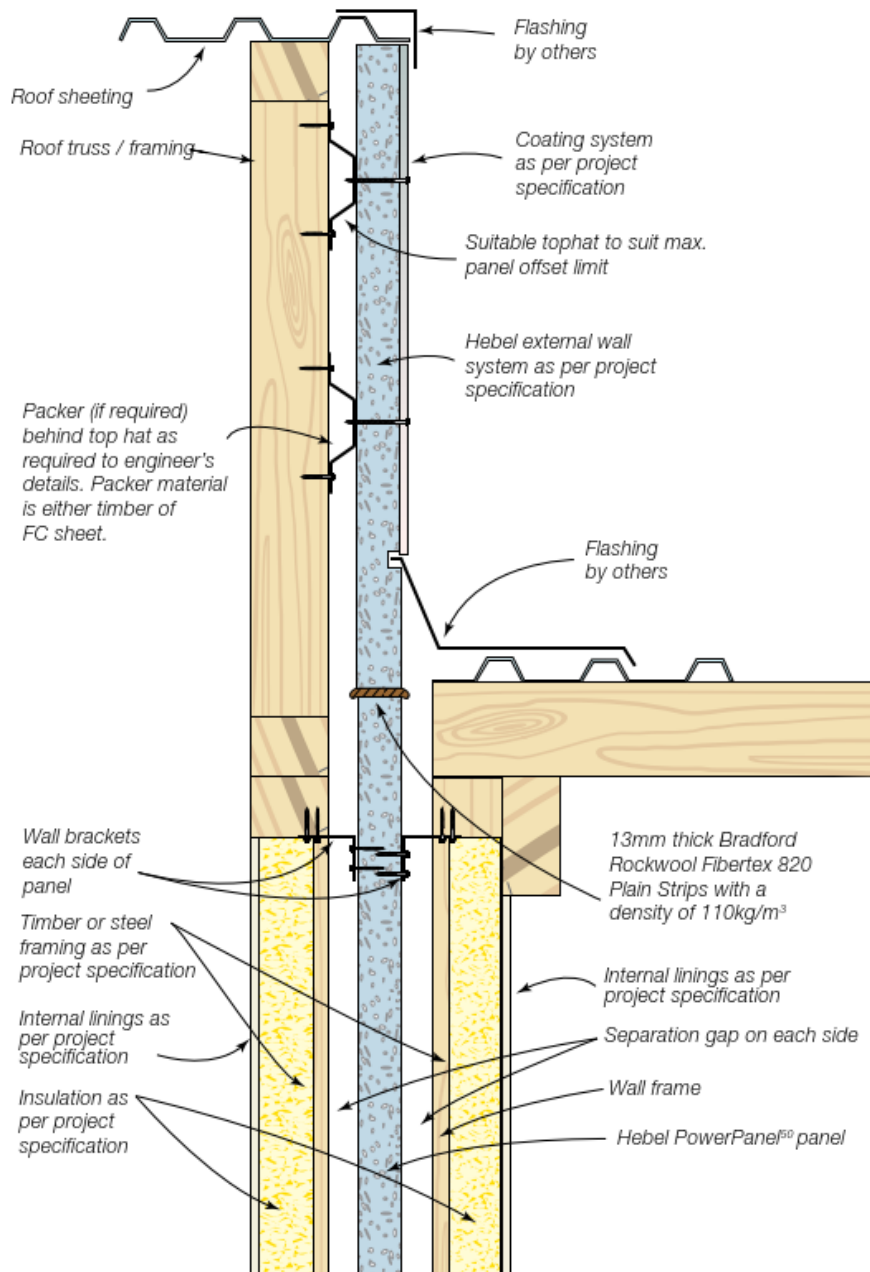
Hebel partywall to external wall detail at stepped roof – 1
